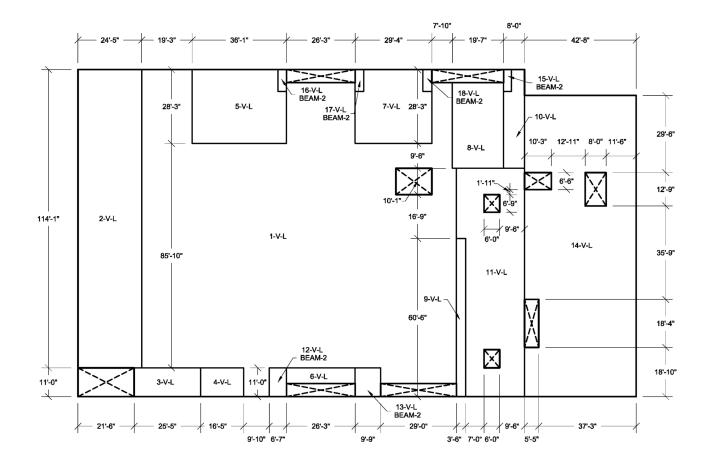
H.3-36 Elevation 35 Looking Down North-South Reinforcement Zones Far Side Face
